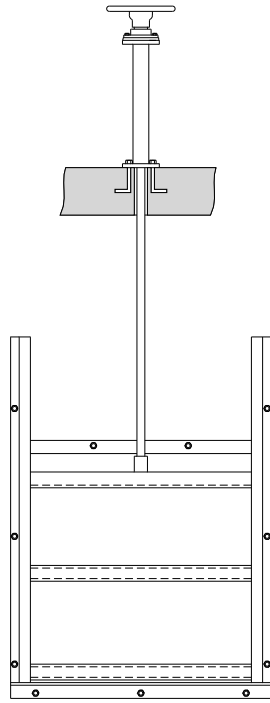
Series 663- Invert Seal, Stainless Steel End-of-Channel Mounting with HY-Q Seal; SectionBB
